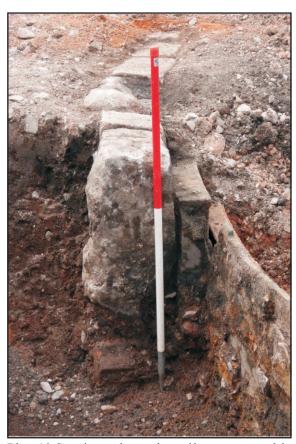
Section through railway turntable construction cut. Looking west. 1m scale.
